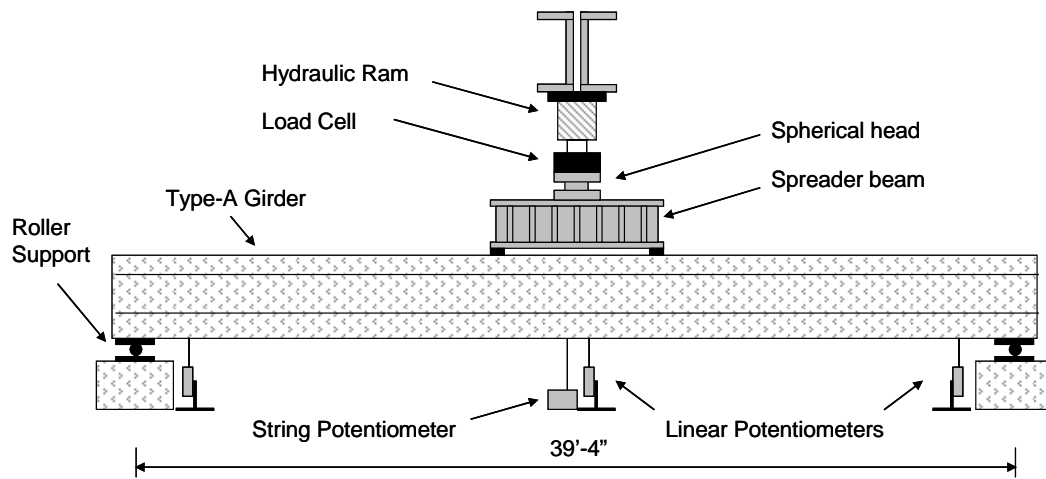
Test setup for static testing of full-scale girders (not to scale)
